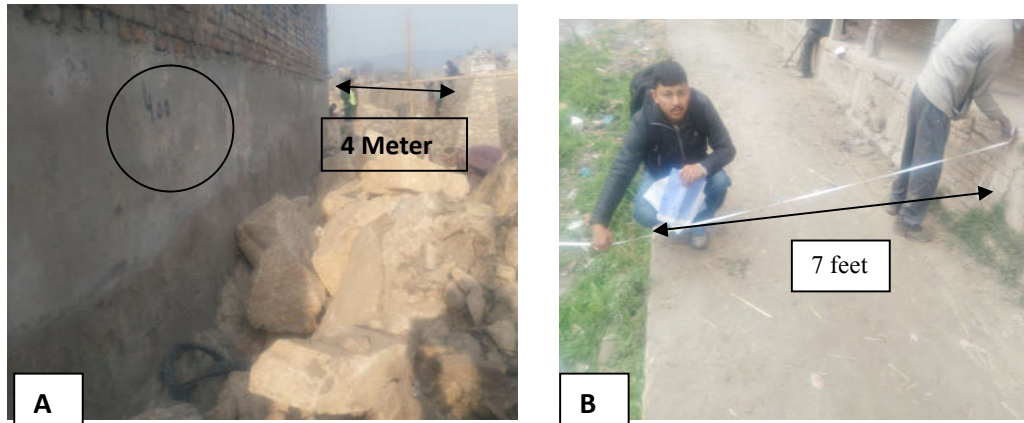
Encroachment by the Garment and Washing Factory (A), Pati build at the Bank of river at Barahisthan (B)
